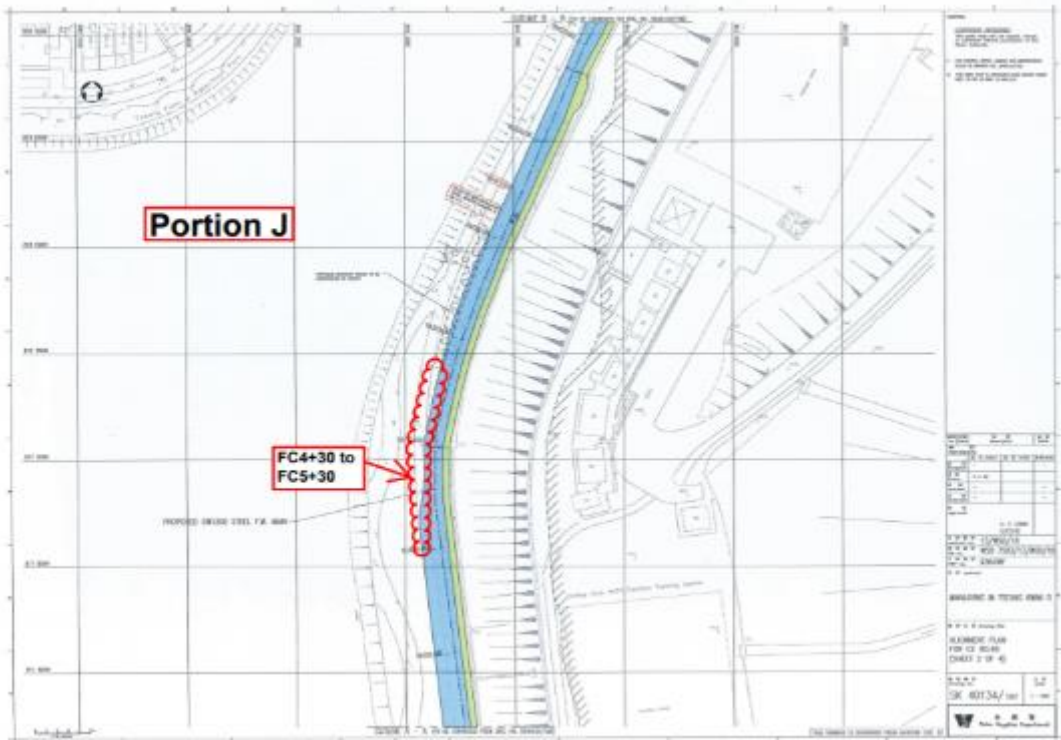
Location Plan – Landfill Stage 1 (Area FC4+30 -FC5+30)
